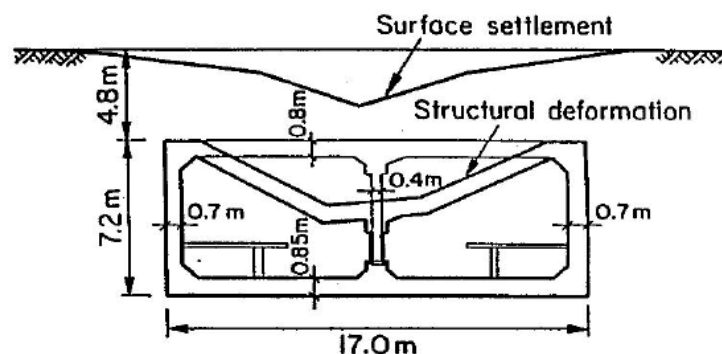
Daikai Subway Station Collapse – 1995 Kobe Earthquake, Japan
